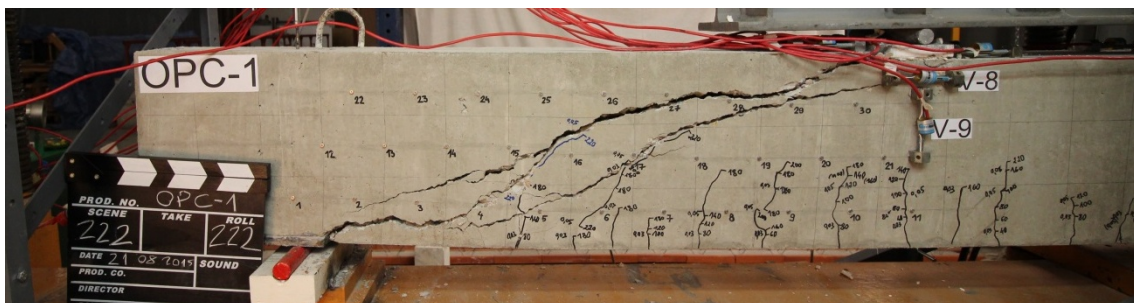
Crack pattern on the front side of OPC-1 after failure
